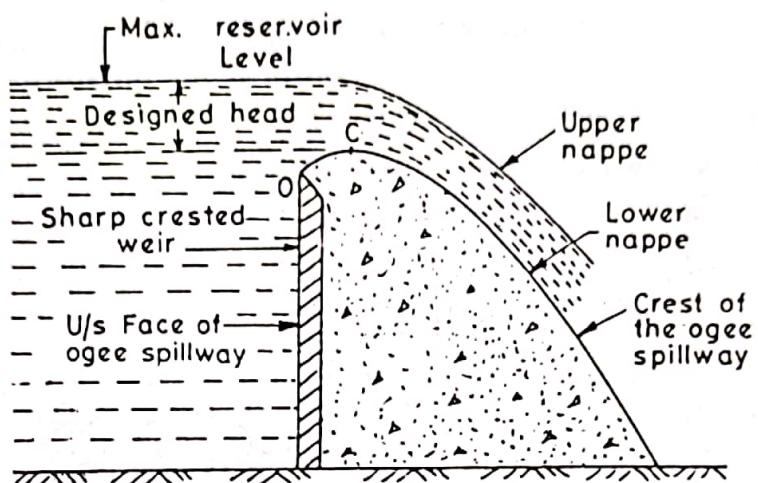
(a) Section of an ogee spillway with vertical u/s face.
